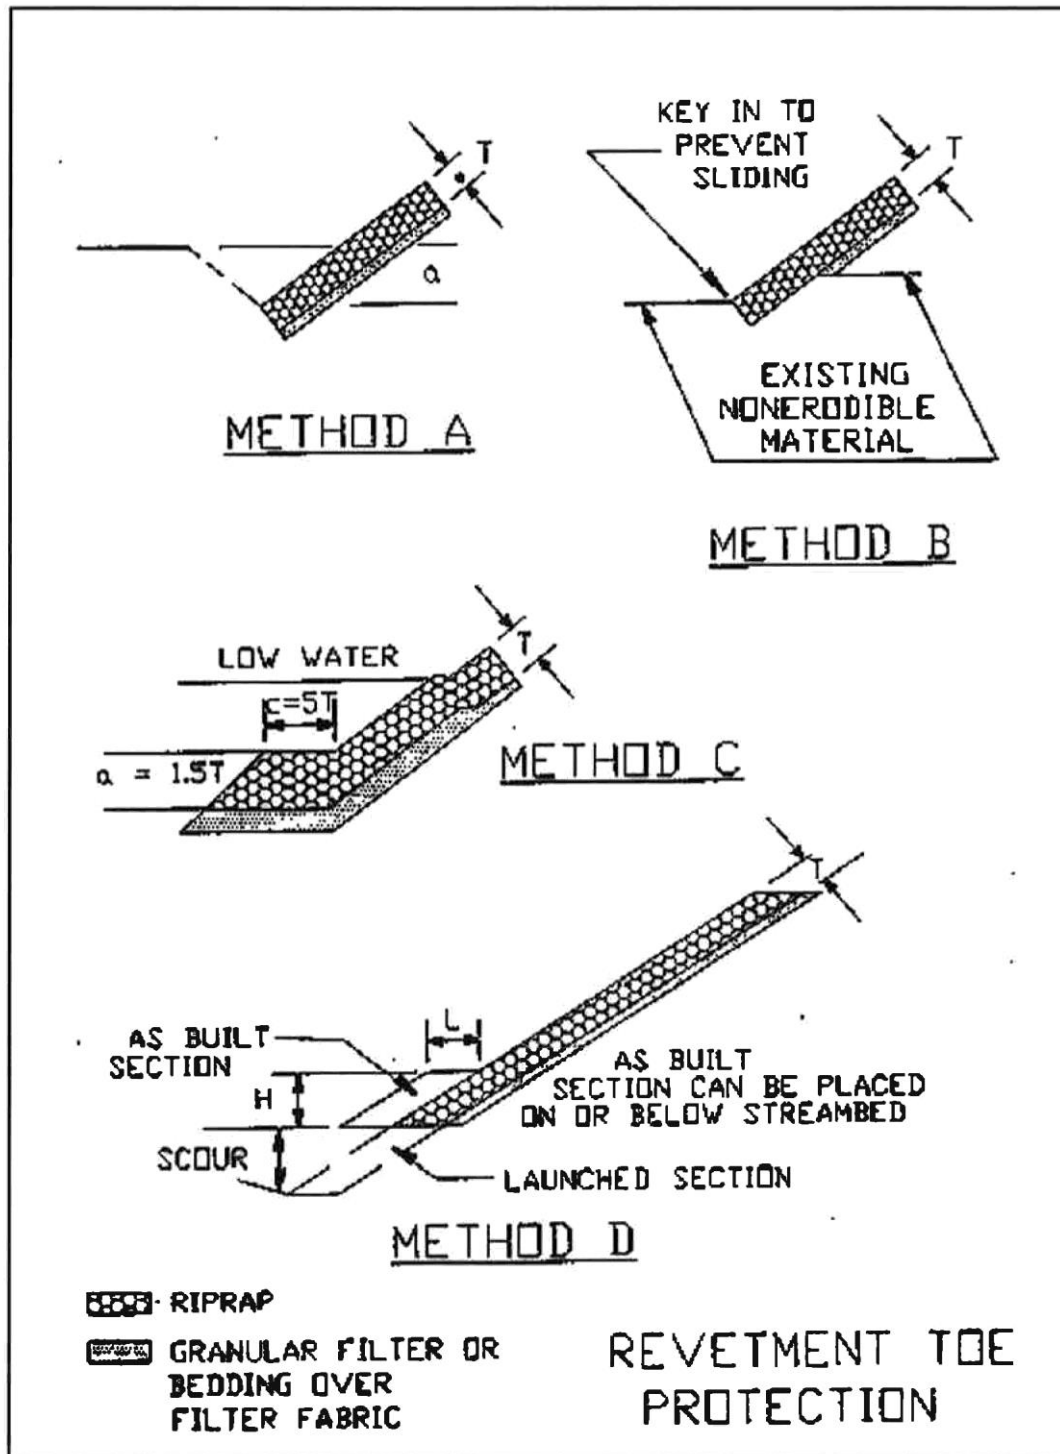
Typical Riprap Design for Revetment Toe Protection
